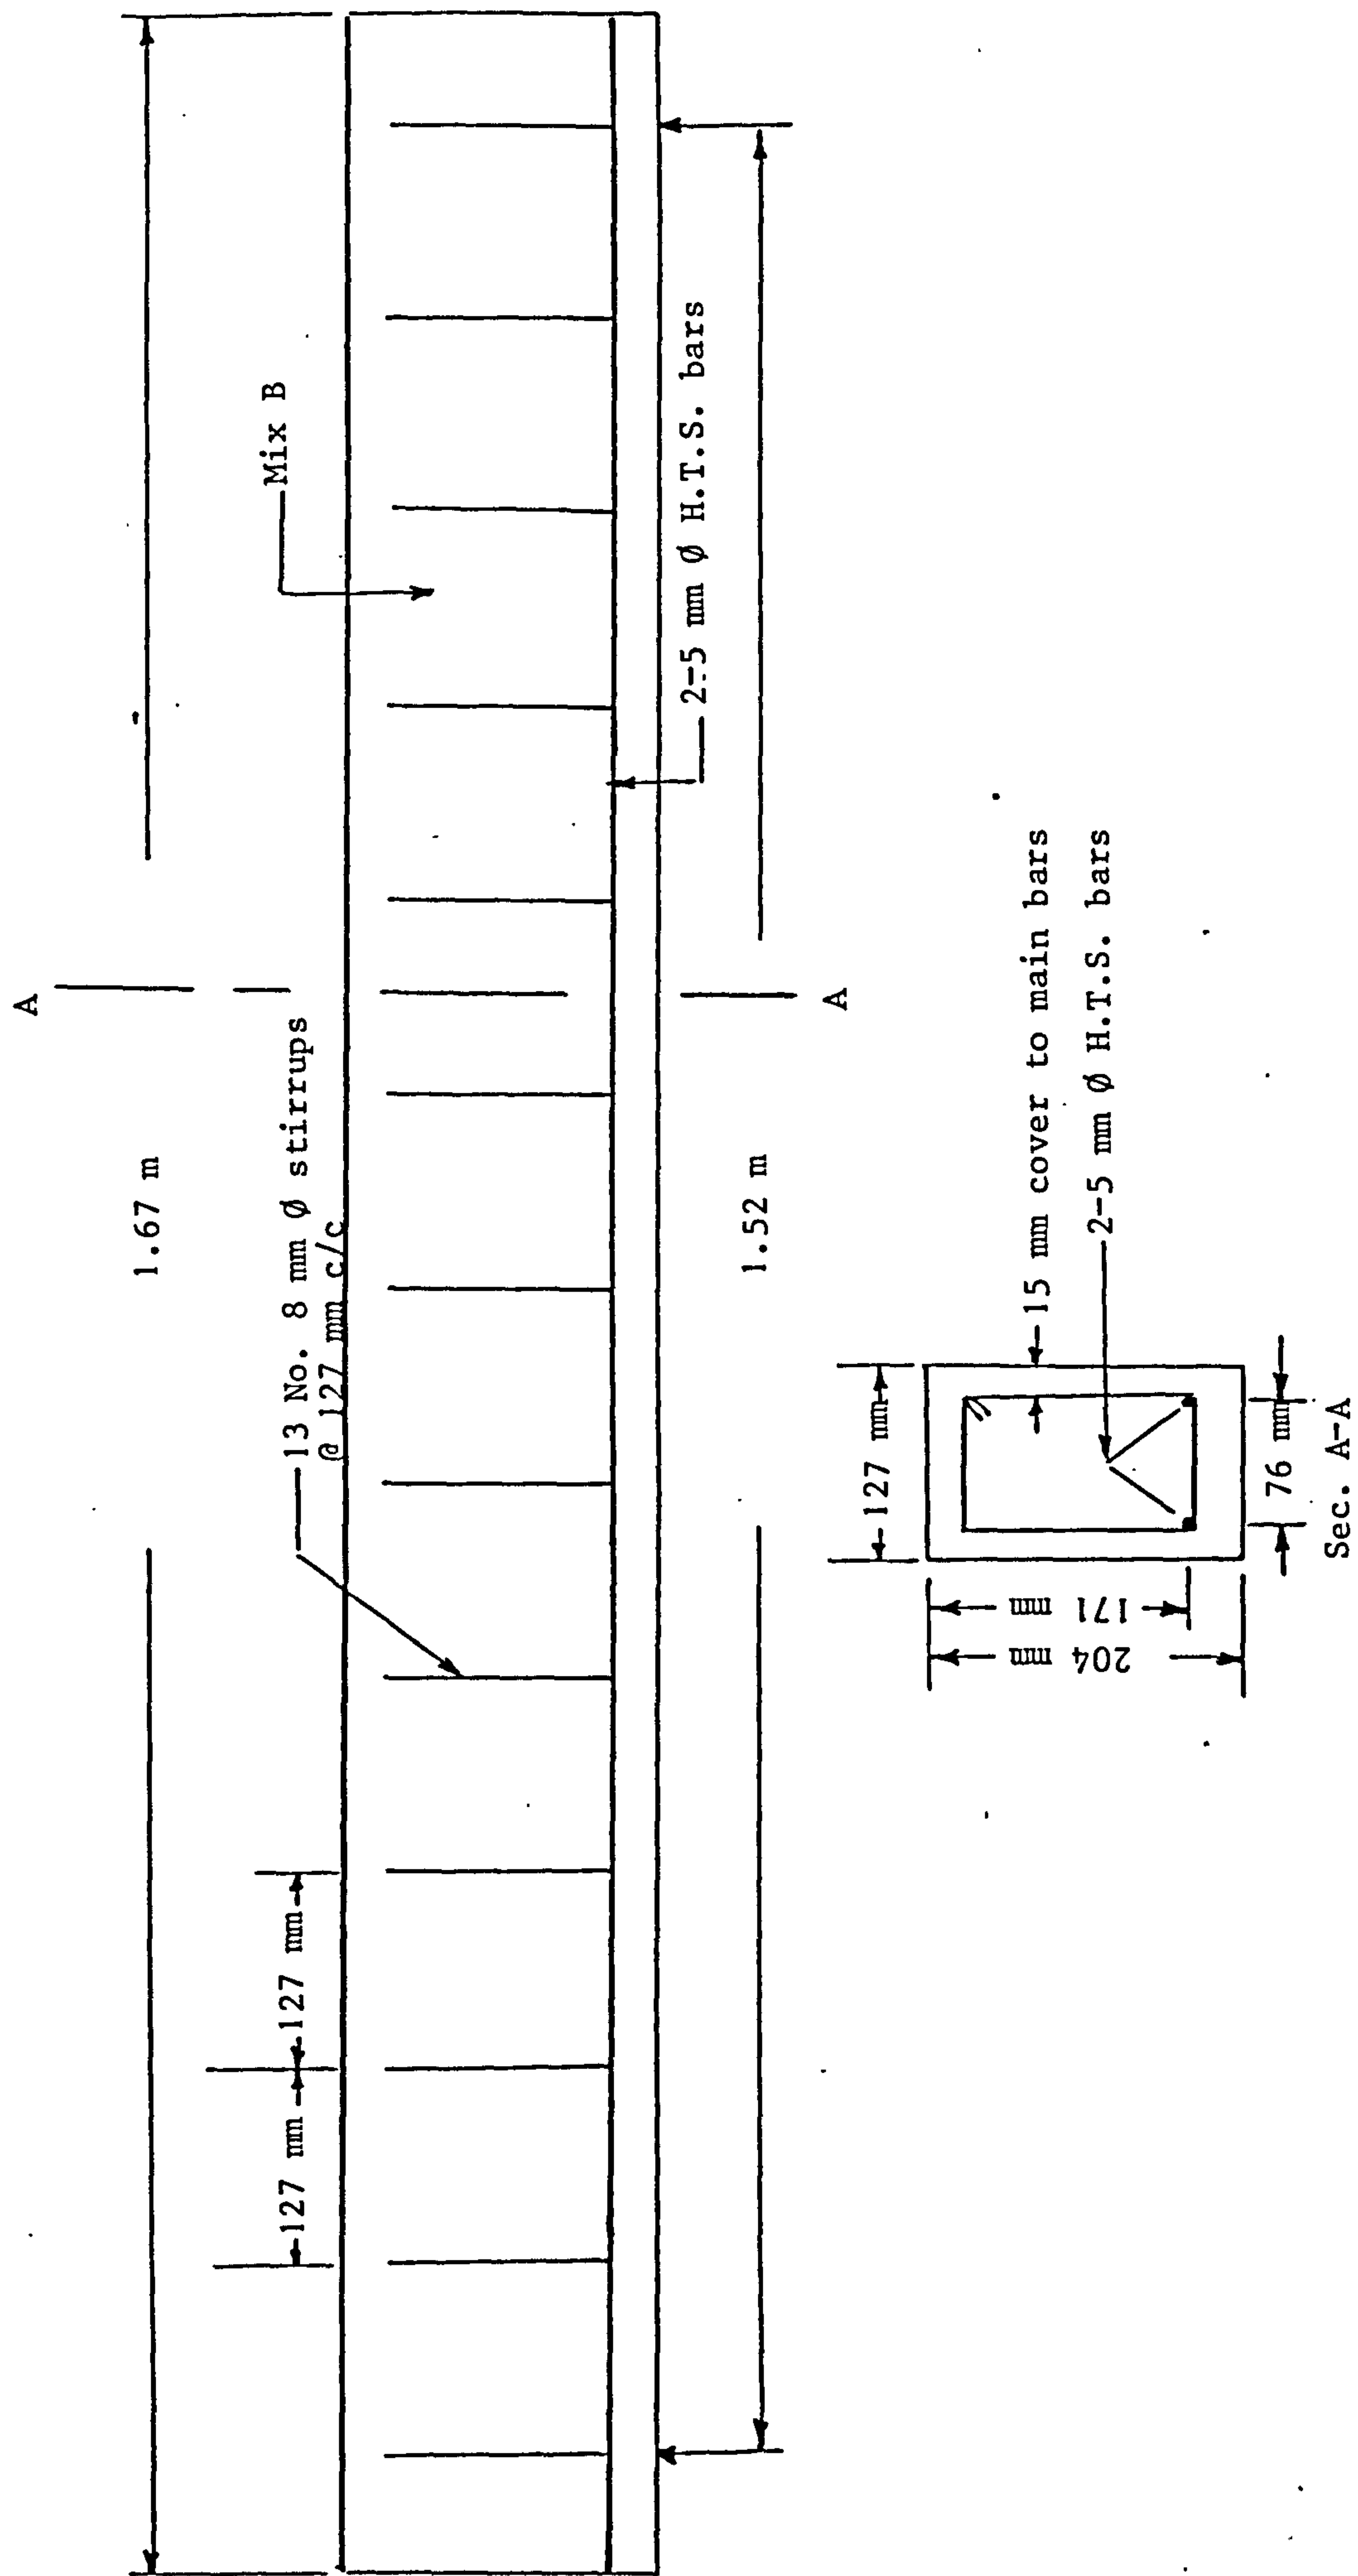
Diagram showing reinforcement in prestressed concrete simple beam.
